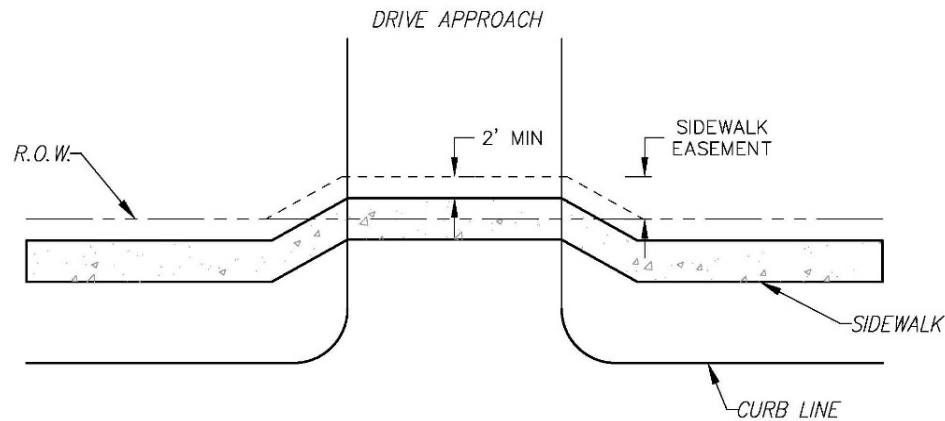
Sidewalk Easement to meet Drive Approach Slope
